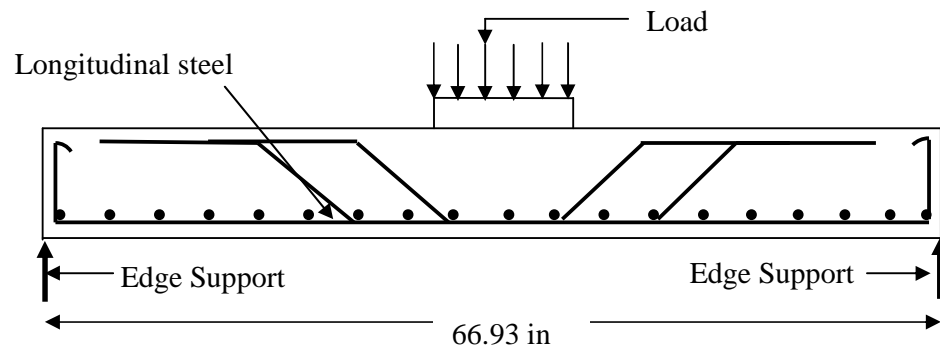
Setup of slab section with bent reinforcement and 11.81 inch or 19.7 inch thick; (Graf 1938)
